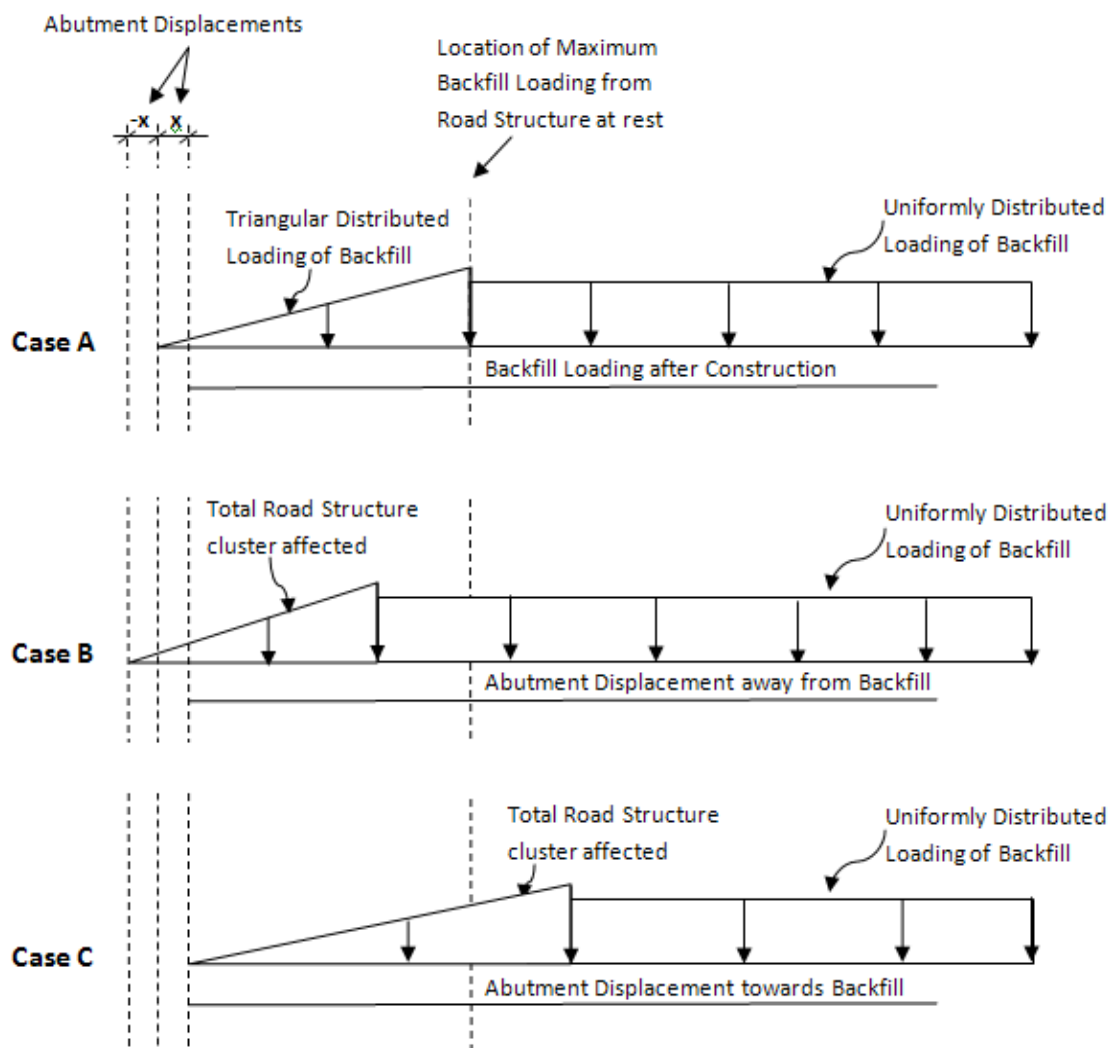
Unrestricted approach slab and road structure displacement impact on backfill soil under distributed load modelling the bridge approach of the road structure
